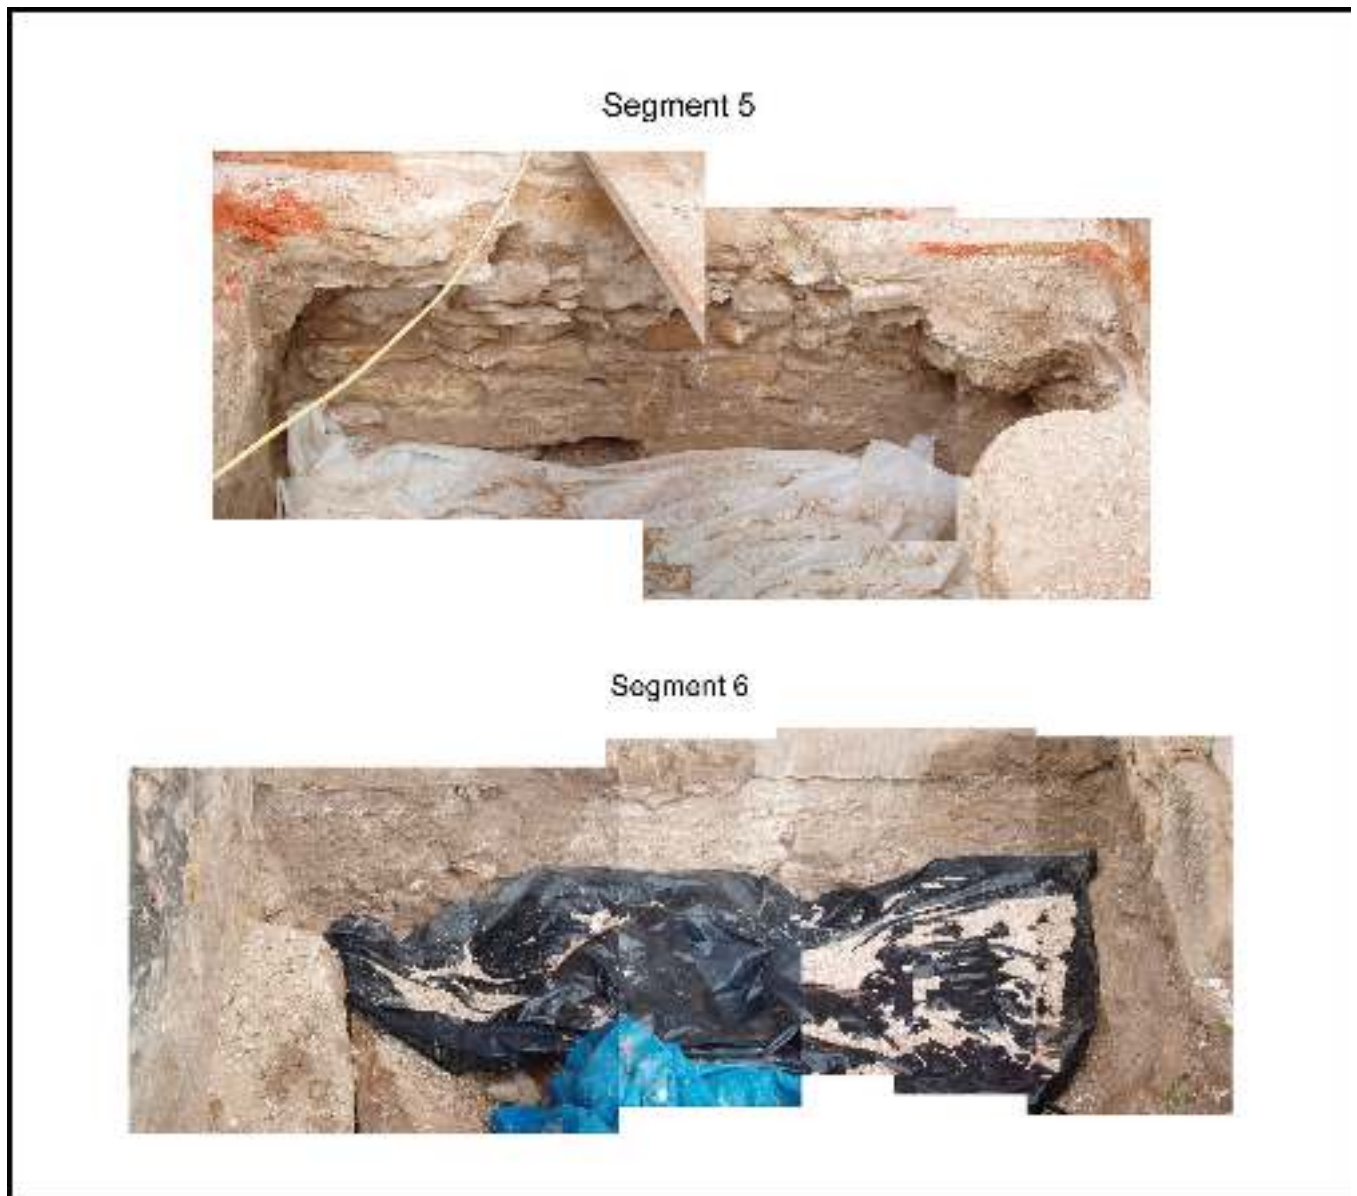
Segments 5 and 6 of the foundation of the east wall of the church, northern portion. Segment 6 is located under the bell tower.
